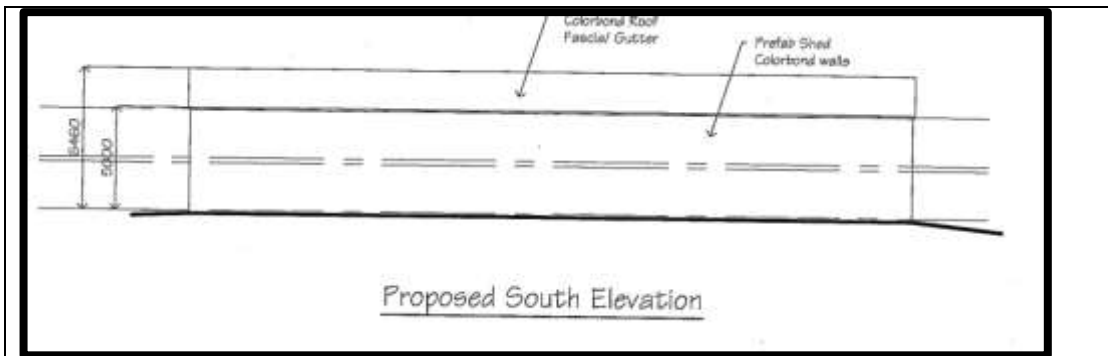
residential outbuilding's proposed southern elevation (wall length 36m)
